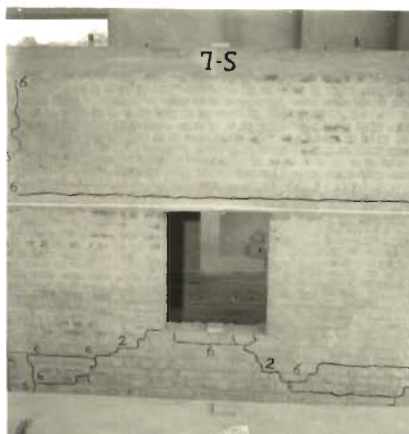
\_ NO FRESH CRACKS IN SOUTH WALL DURING SHOCK NO. 5 ( MODEL 7 )
